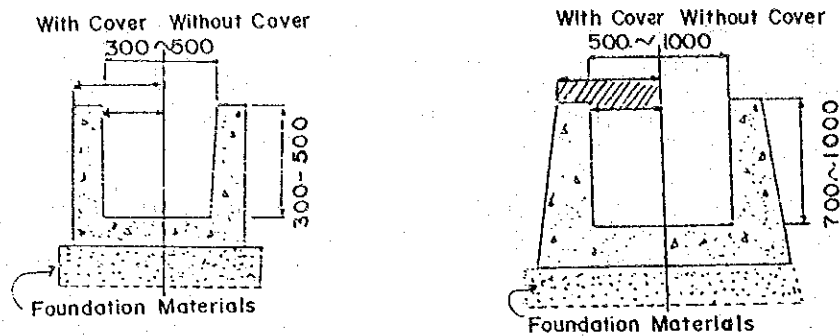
CAST-IN-PLACE CONCRETE DITCH
